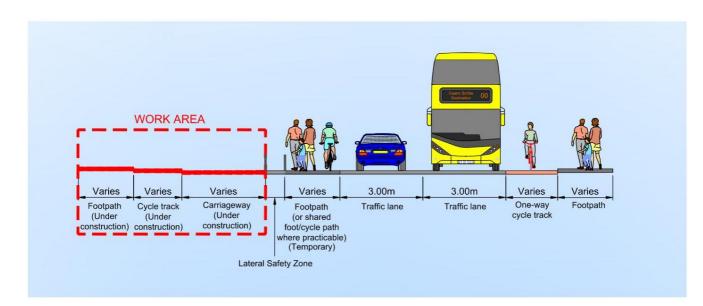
Traffic Management Cross Section, Section 4a – Stage 1
